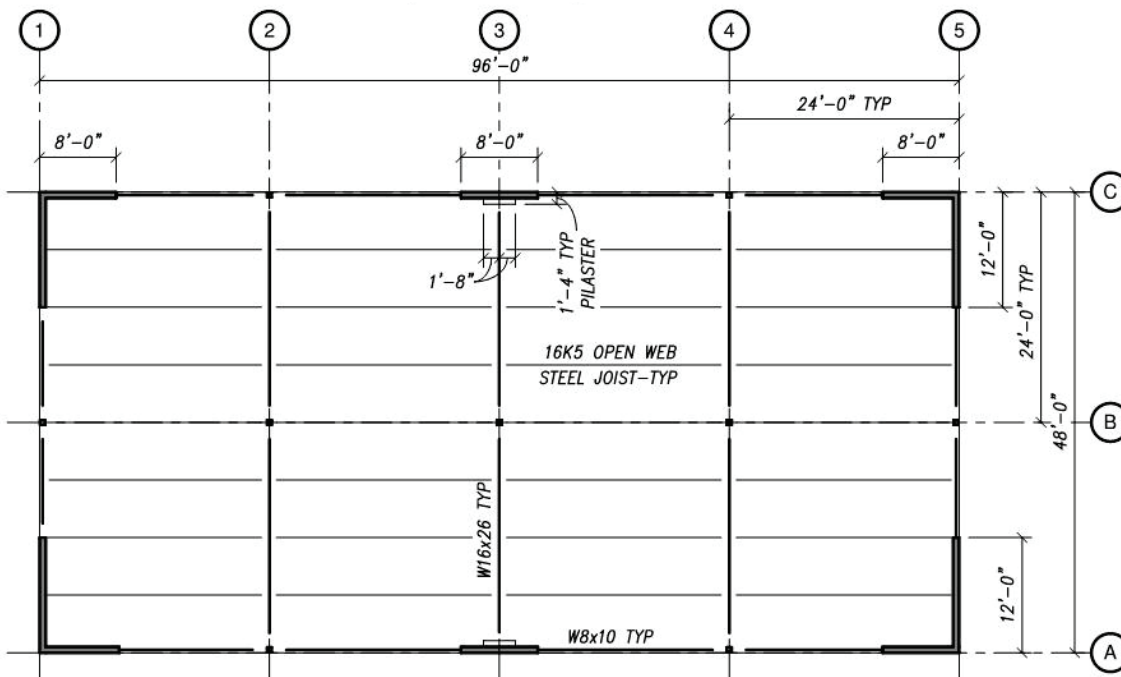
Single-story commercial building roof framing plan: COM1, COM4, COM7.
